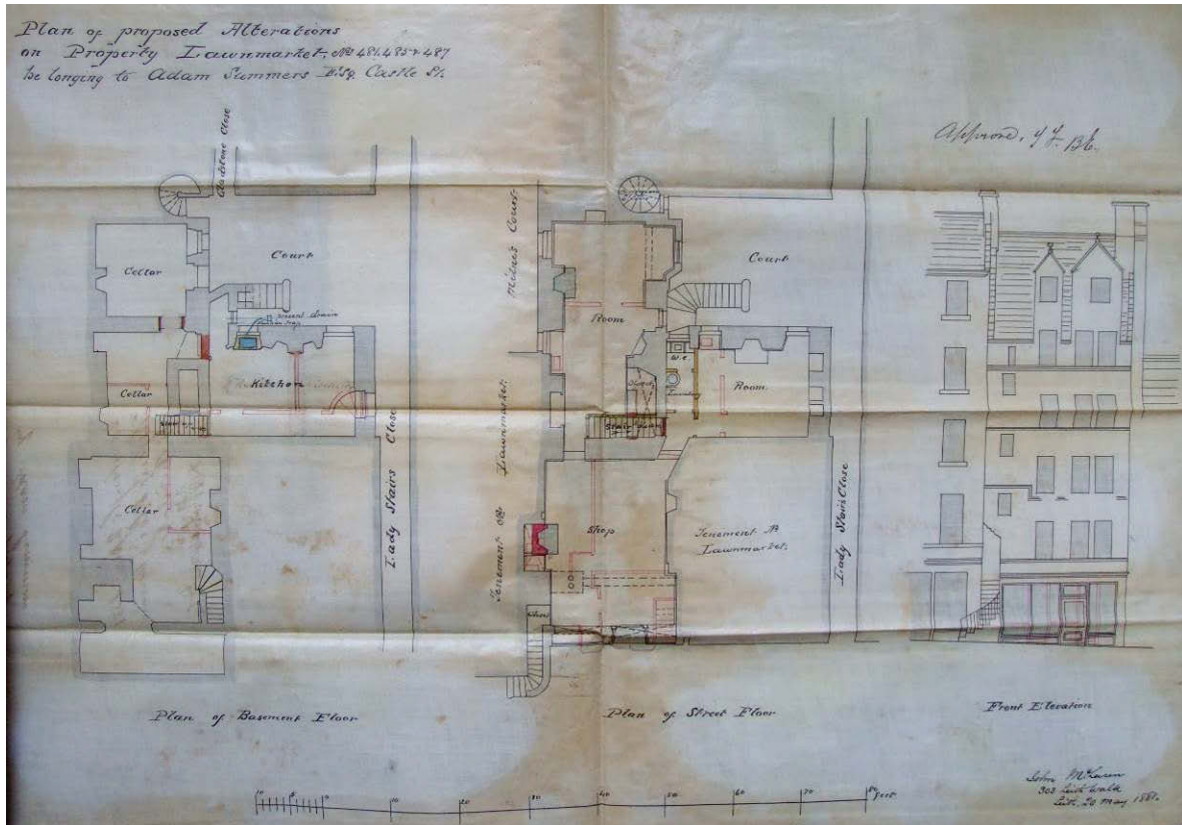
Plans and elevation showing warranted alterations scheme for basement, ground and elevations. Application dated 9th June 1881. City of Edinburgh plan store
